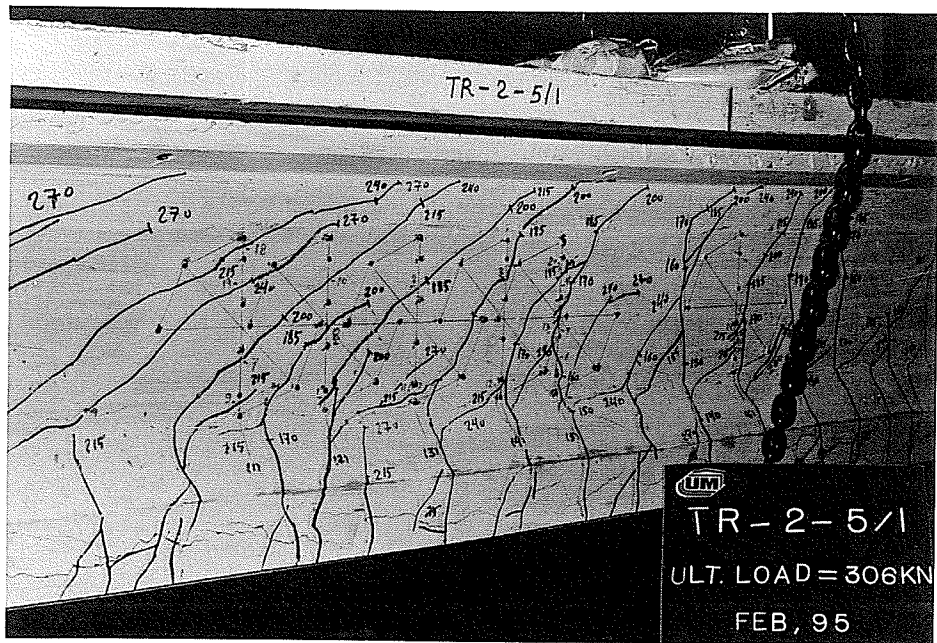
(b) Diagonal crack pattern of beam TR-2-5/1
